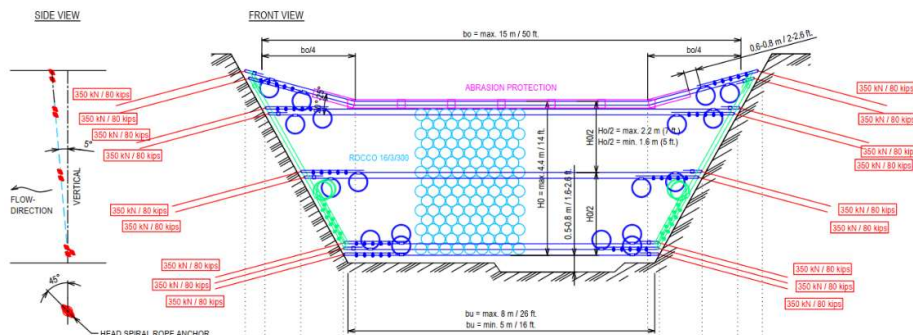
Cross-section of the construction through the mesh barrier. (based on design project)
